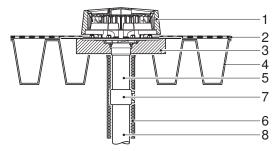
Installation in a lightweight roof uninsulated with roof foil
